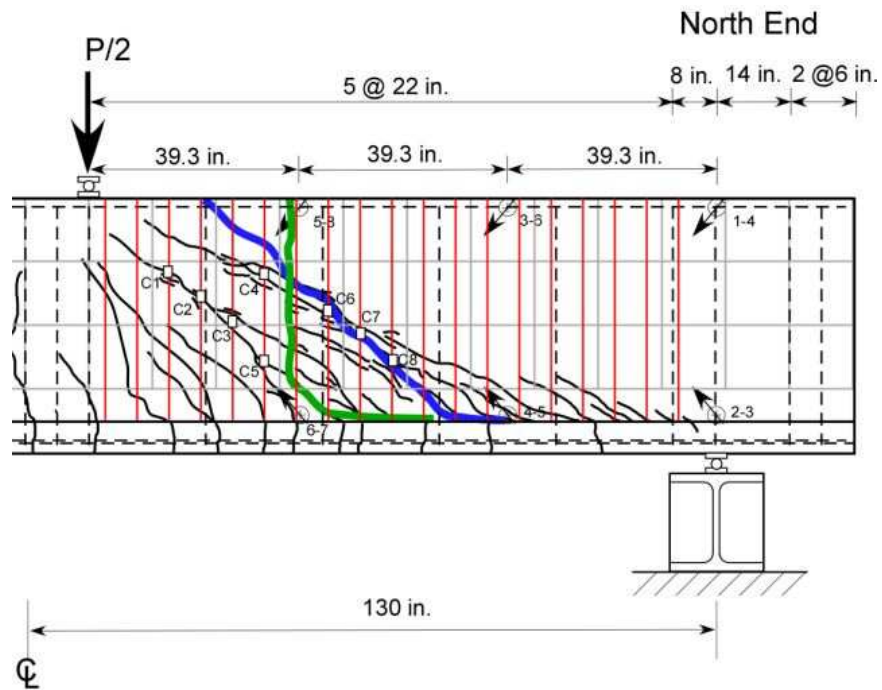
Specimen IT.7.22.6.S crack map (failure test)
